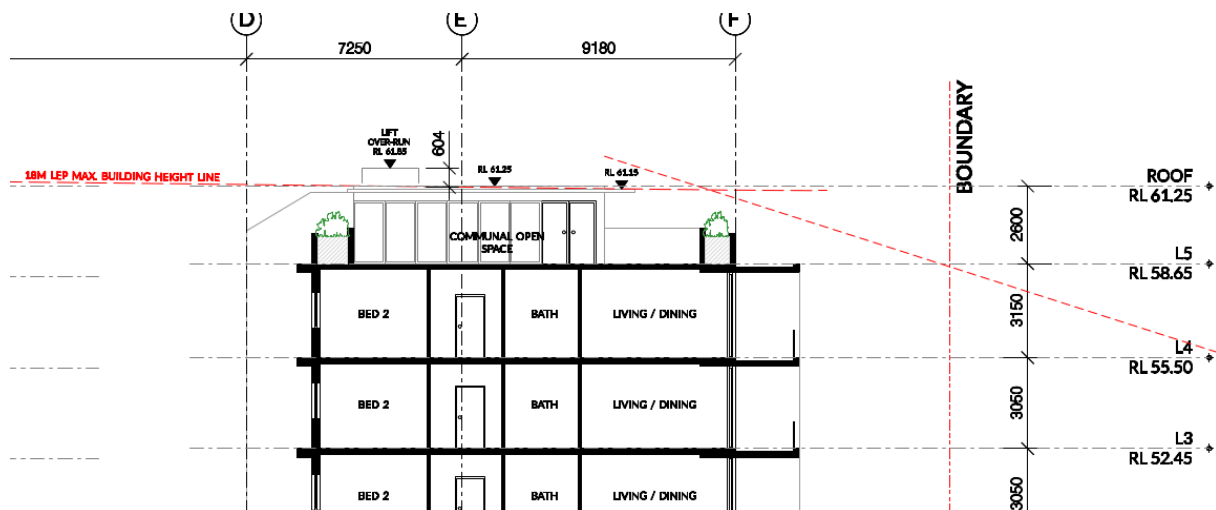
Extract of the east building in Section A-A (Drawing No. A-2500)
